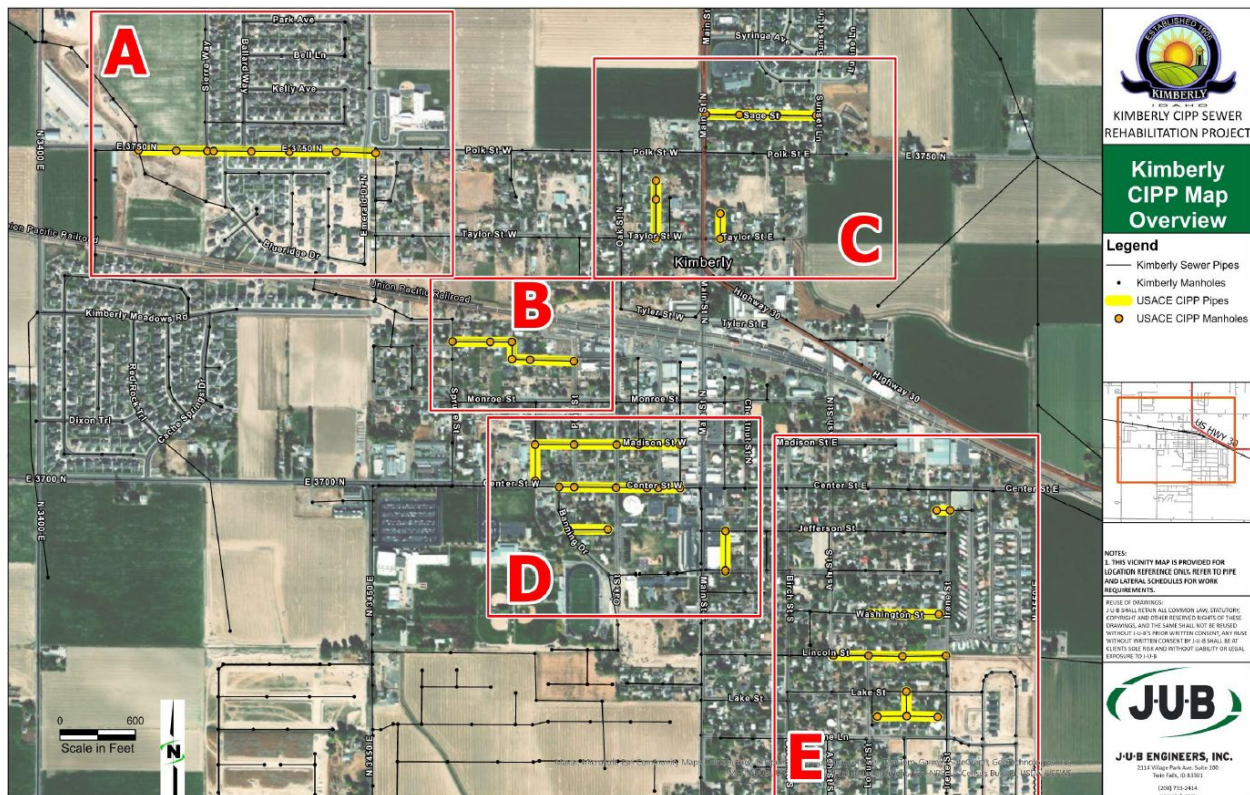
Proposed USACE Funded Sewer Main Repairs (YELLOW) and Manholes (ORANGE) Sections A – E.
